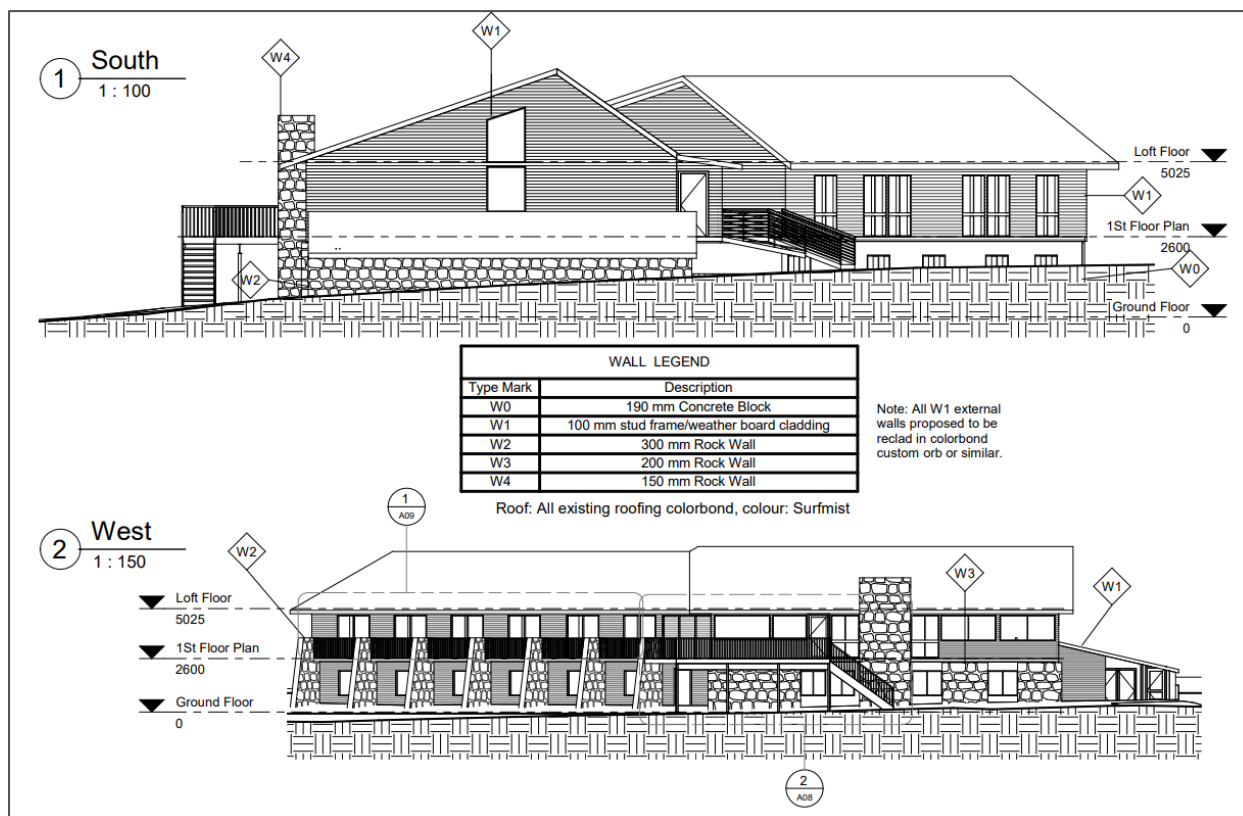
| Altitude Lodge south and west building elevations (Source: Applicant's documentation)
